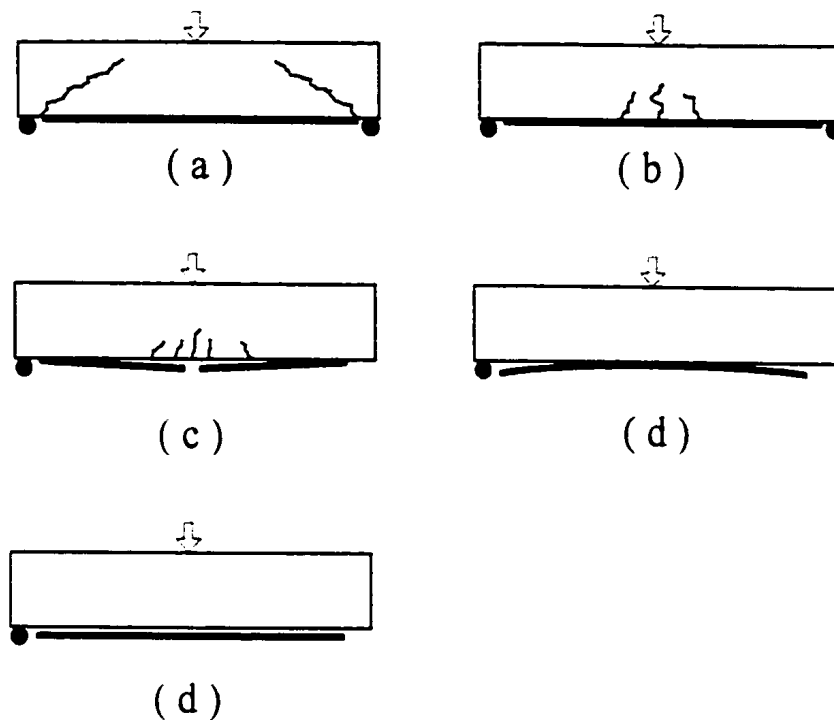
Failure mechanisms of FRP strengthened concrete beams. (a) concrete shear. (b) flexural cracking, (c) rupture of an externally bonded plate followed by cracking of concrete (d) plate peeling-off and (e) entire plate debonding.
